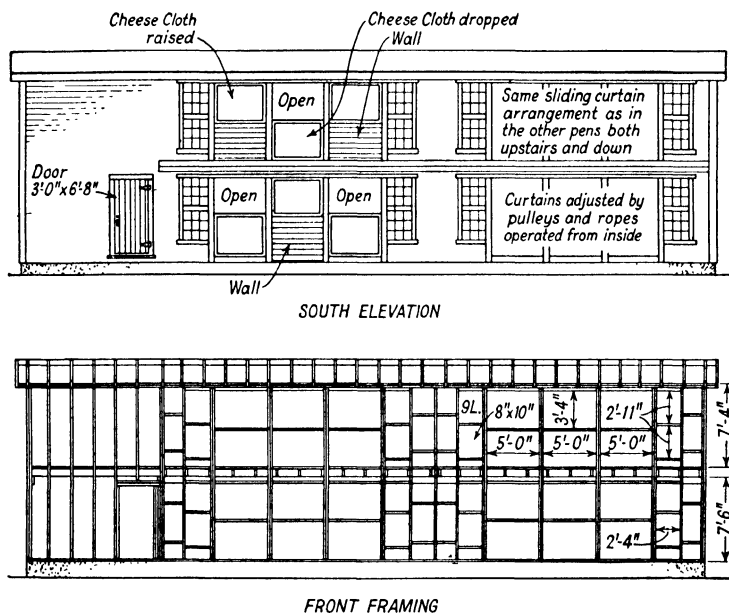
Two-story laying house 30' \times 50' with 12' feed and storage room at end.
